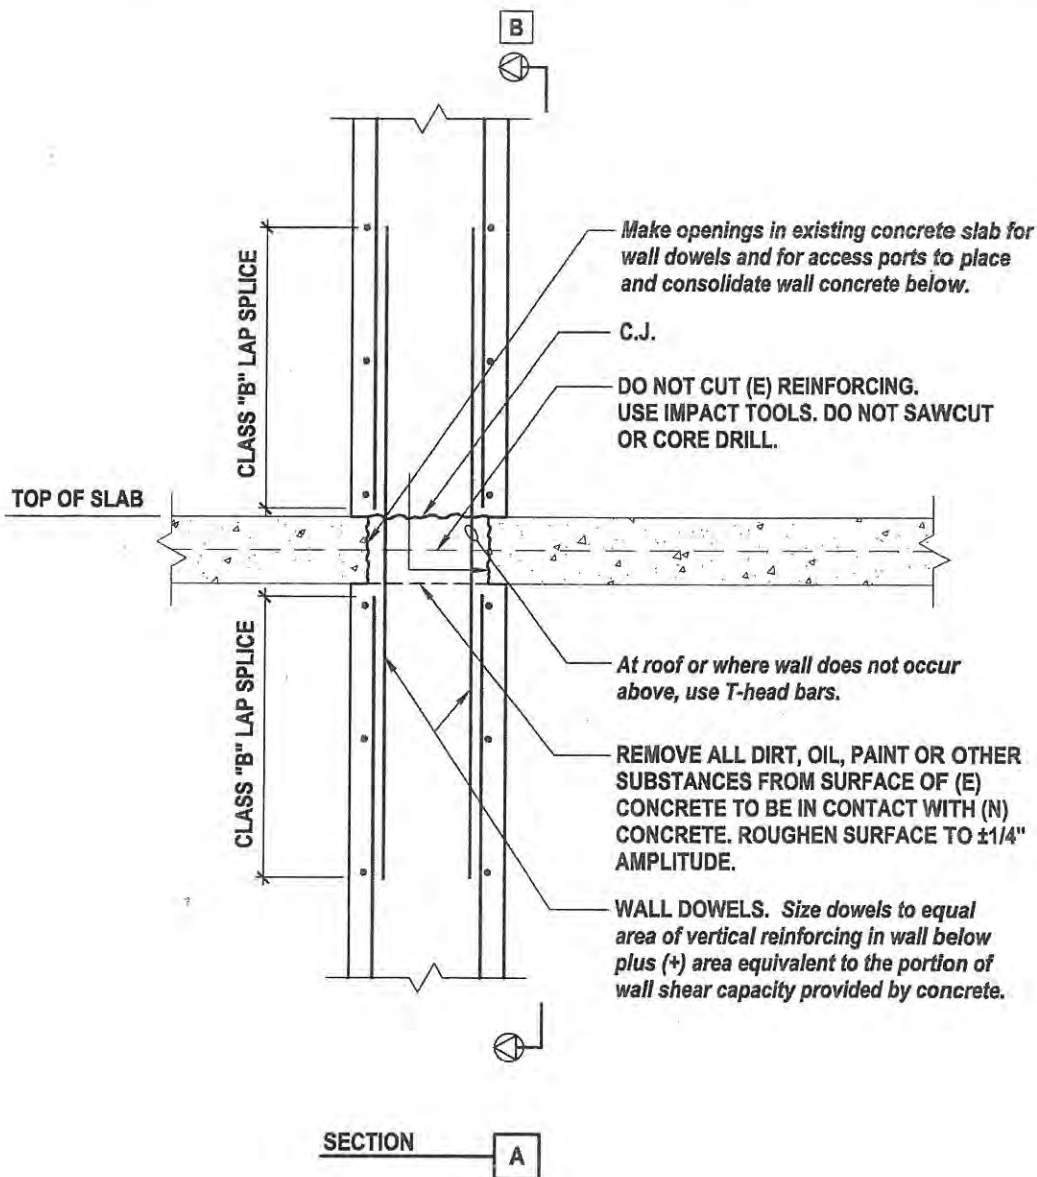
A: Concrete Wall Connection to Concrete Slab
